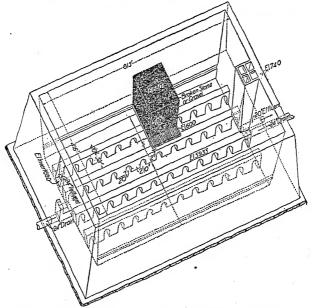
Isometric view of contact baffle unit, Pittsburgh filtration plant.
